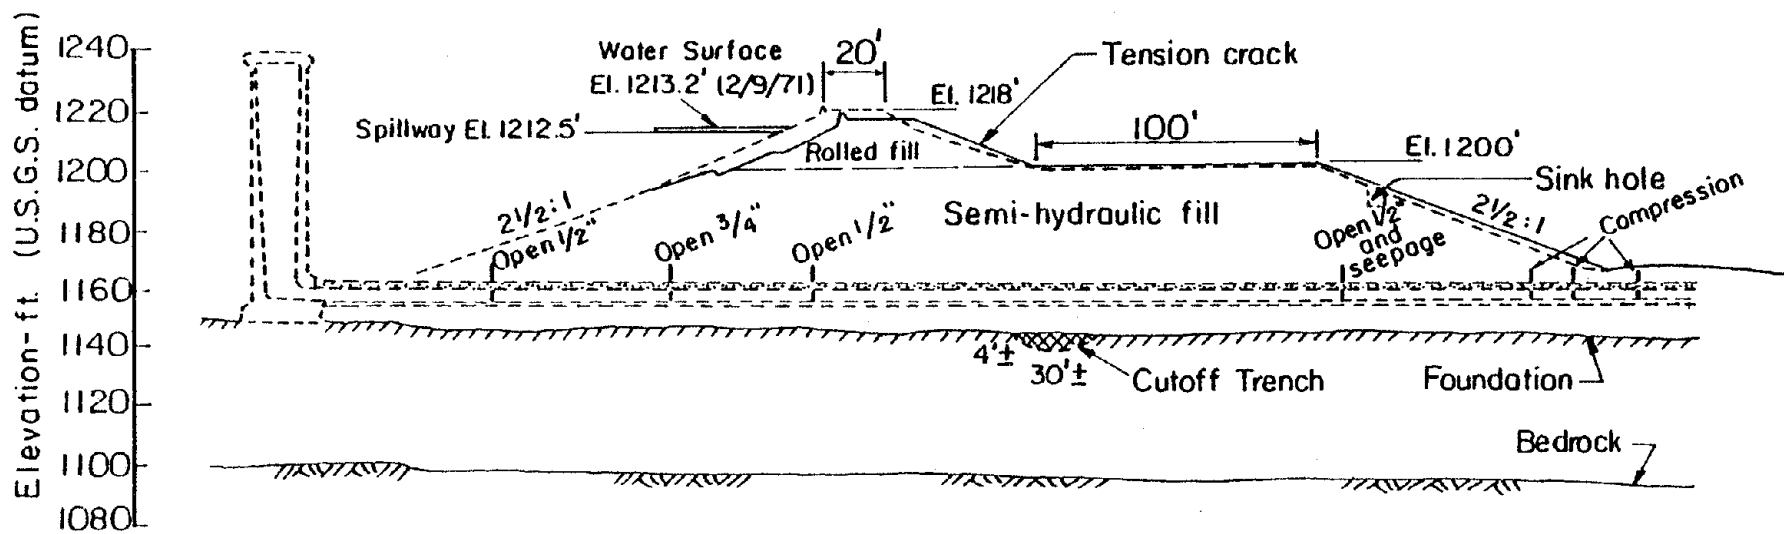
CROSS-SECTION THROUGH UPPER SAN FERNANDO DAM
